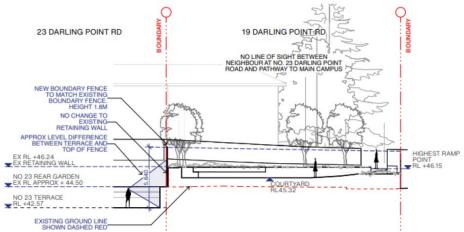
Sight line between the rear yard of No.23 Darling Point Road and the highest point of the proposed ramp at No.19 Darling Point Road.
